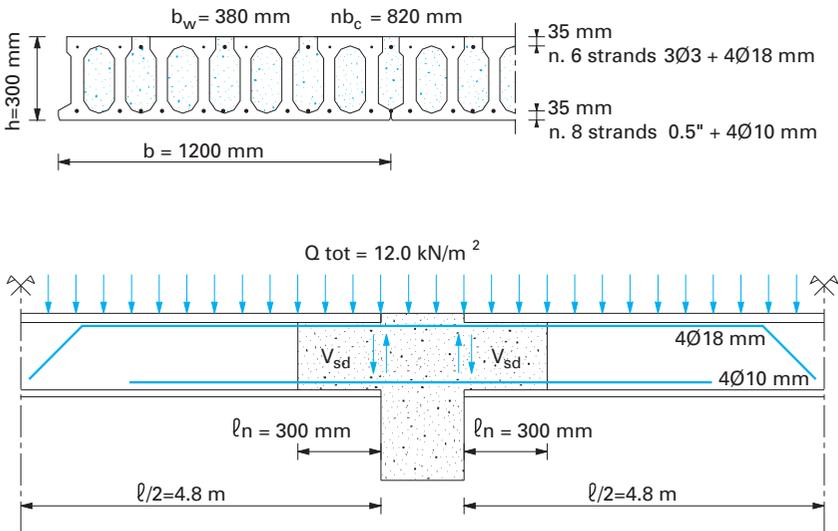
Verification of a slip-formed hollow core floor of depth $h = 300 \text{ mm}$ as a clear span between beams cast in situ (floor without direct support on the beam).
